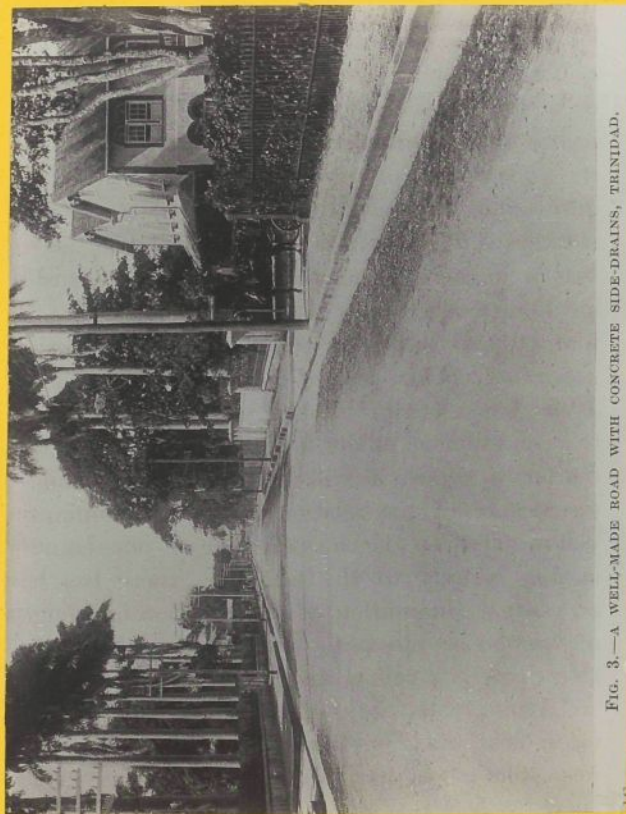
A WELL-MADE ROAD WITH CONCRETE SIDE-DRAINS, TRINIDAD.
